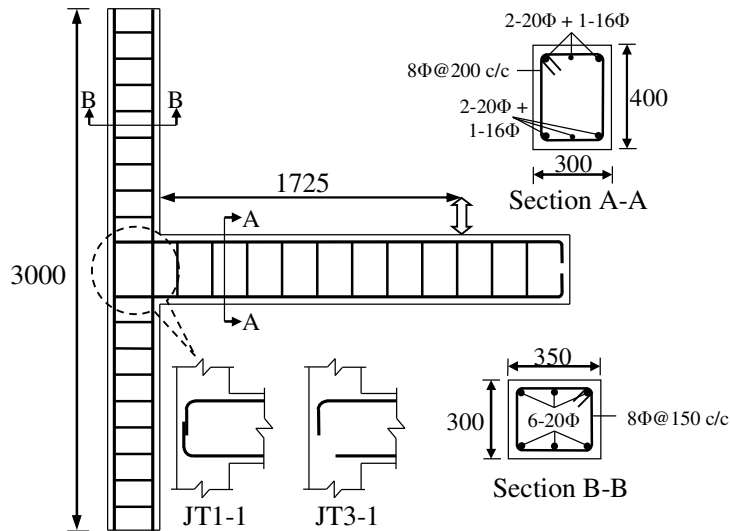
Details of beam-column joints tested by Genesio and Sharma (2010)
